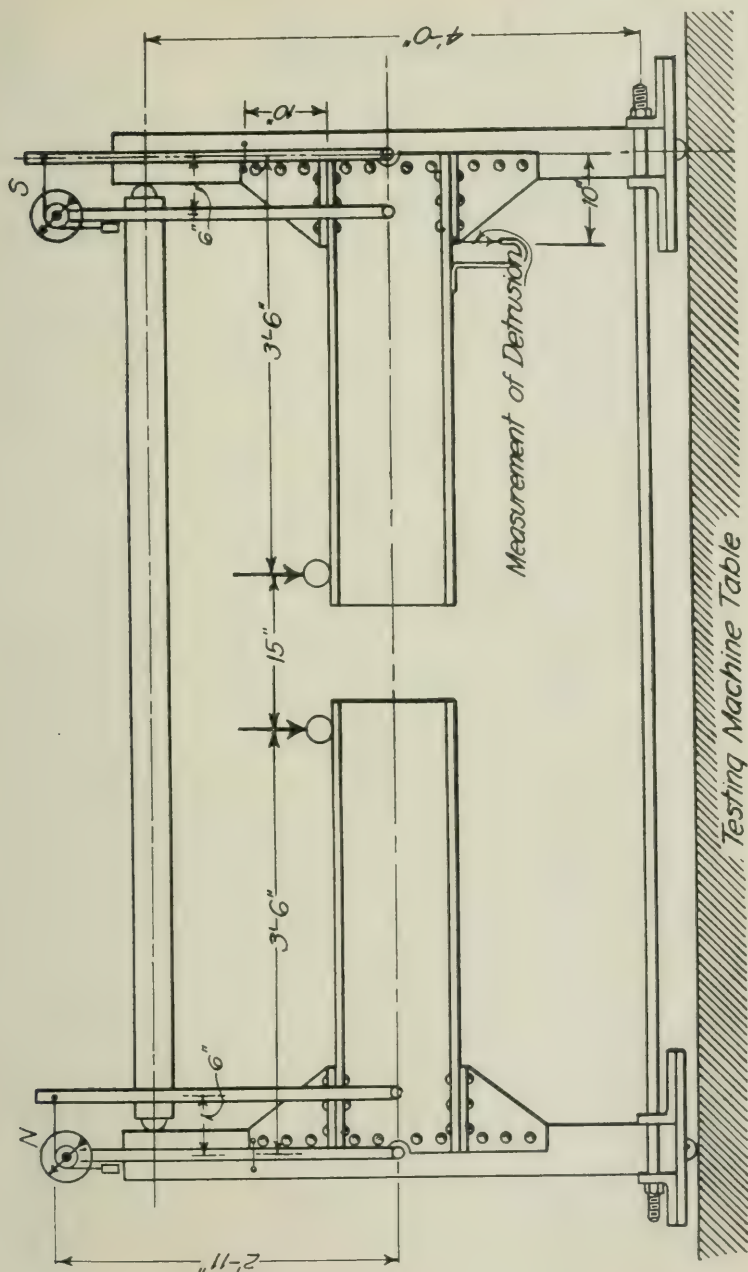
MEASUREMENTS OF ROTATION FOR TEST PIECES 44
